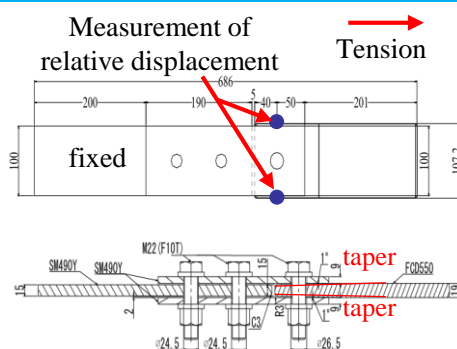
Geometrical configurations of Specimen (unit: mm)
